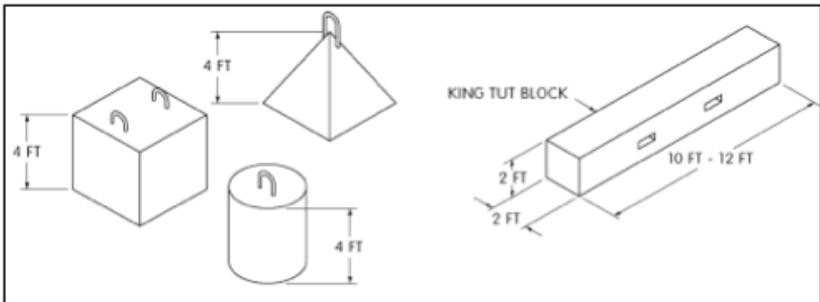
Typical Cabled Concrete Blocks (UFC 4-0222-02)
